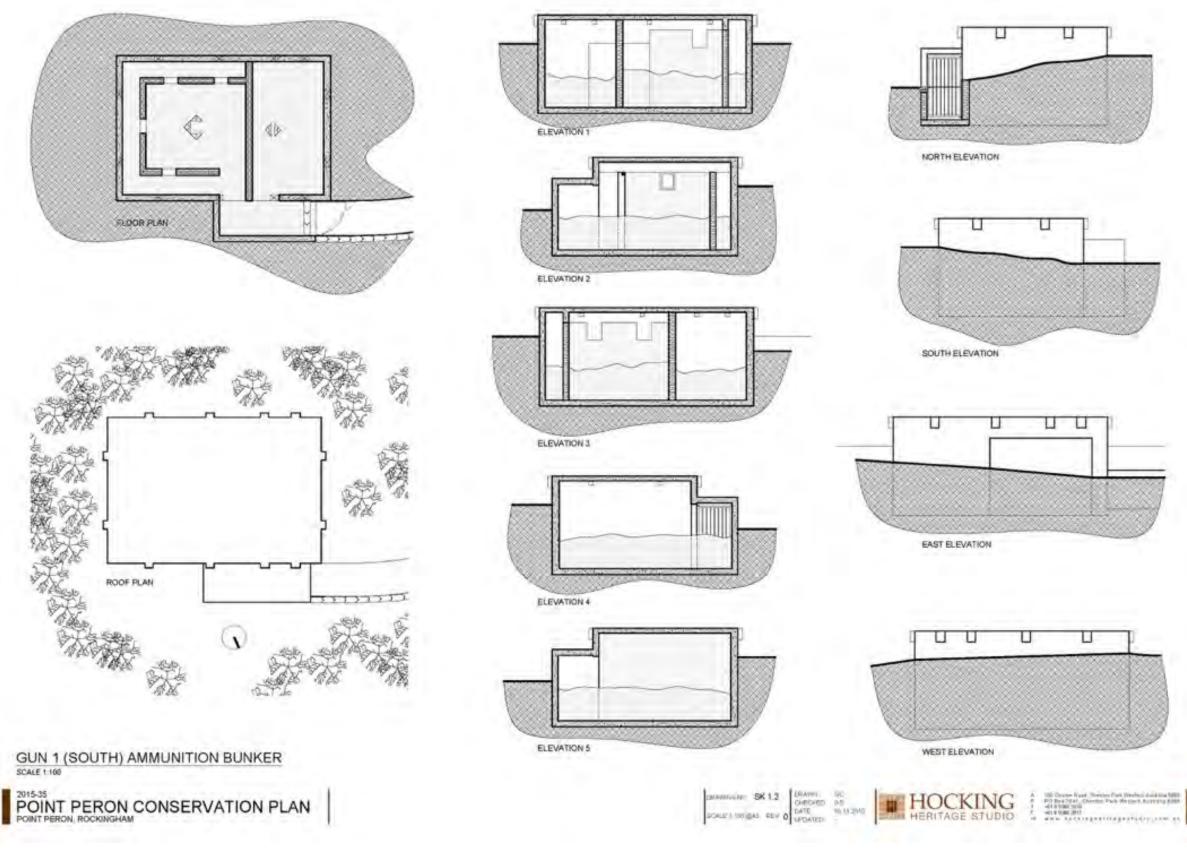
Ammunition Bunker No. 1 Plans and Elevations
